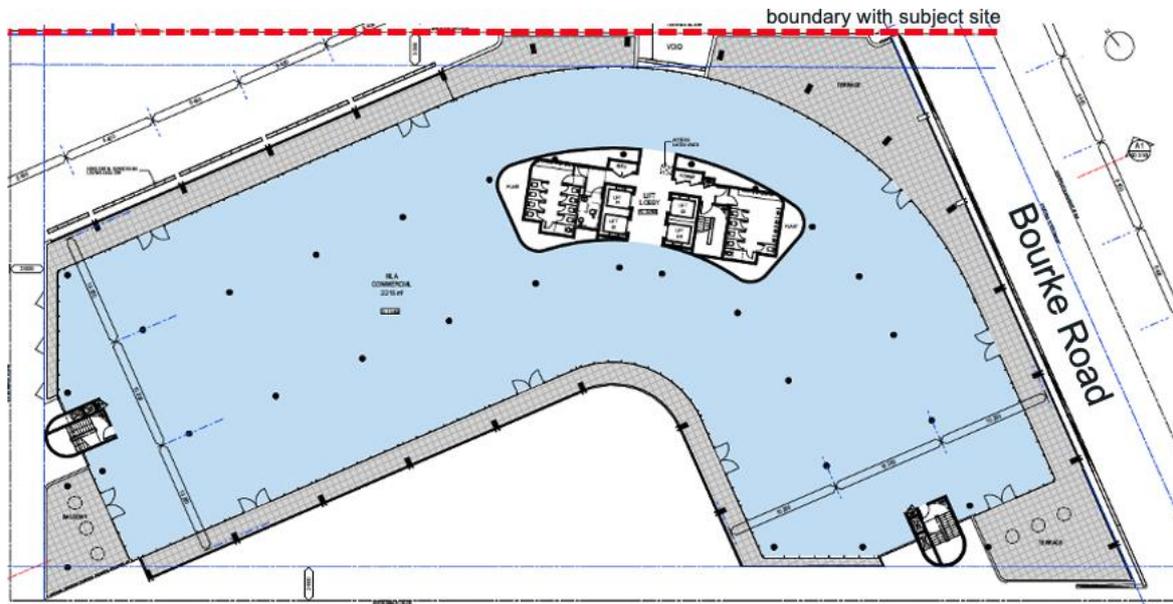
Approved floor plan (Level 3) of D/2018/360/A for 29-33 Bourke Road, Alexandria
